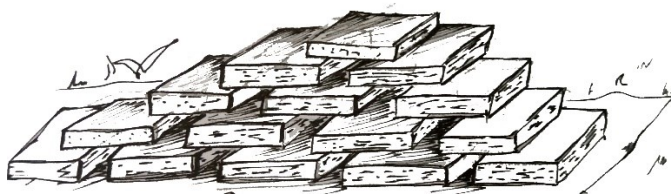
Stacking of dry adobe bricks (Aşanlı, 2021).
